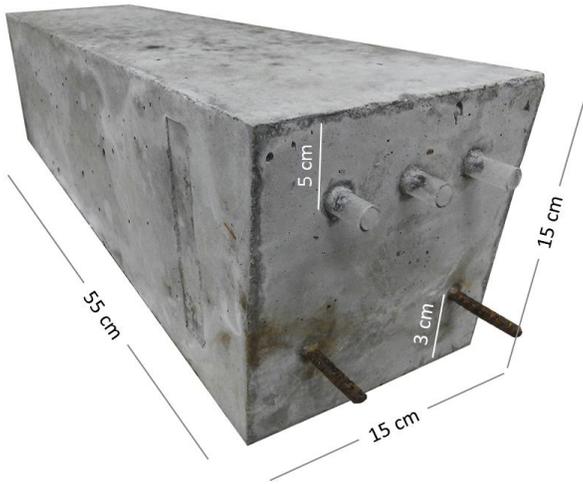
concrete specimen with randomly dispersed capsules and glass tubing for testing of water flow across cracked sections.
